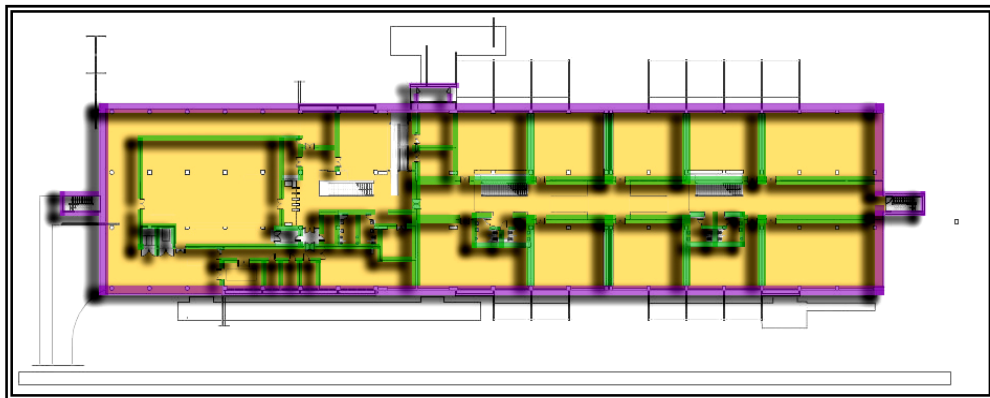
Adopted basement floor plan of METU Silicon Block. *Source:
